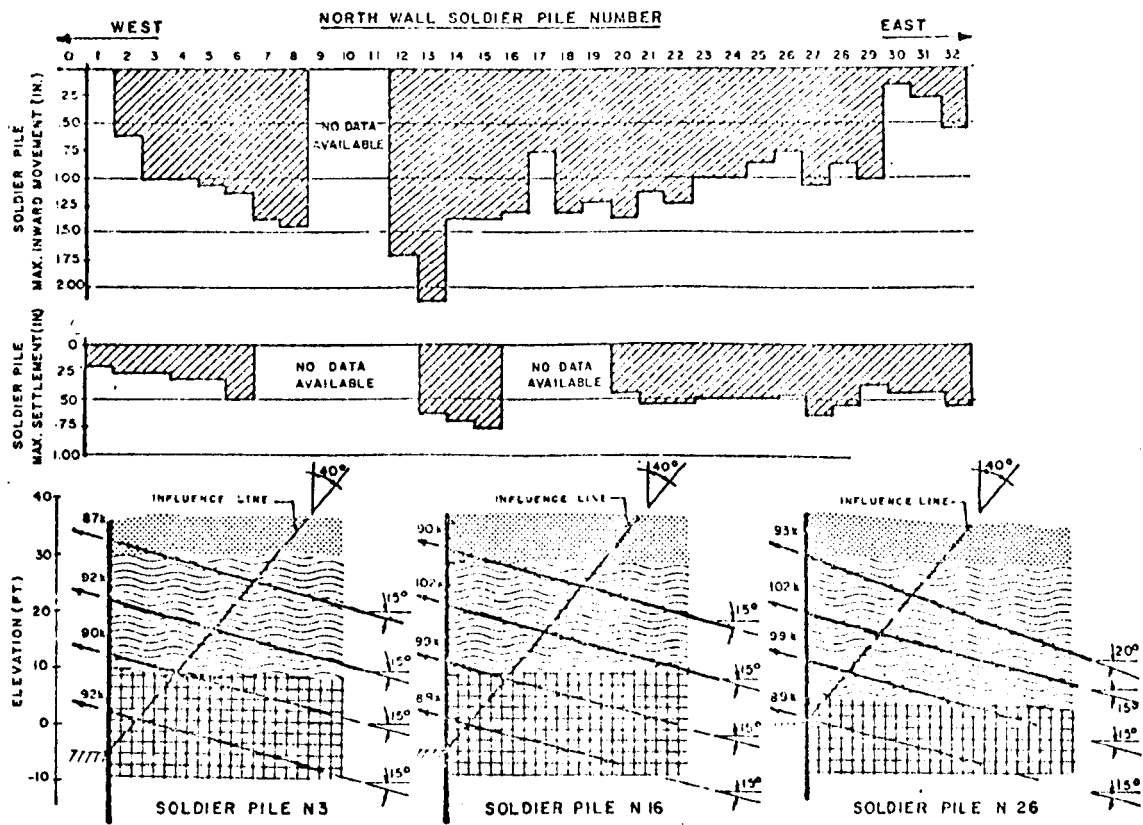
PILE MOVEMENT AND TIEBACK LOCATION-NORTH WALL
